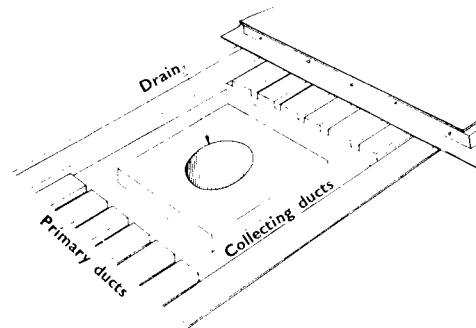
Collecting ducts around a drain connect the primary ducts with each other.
